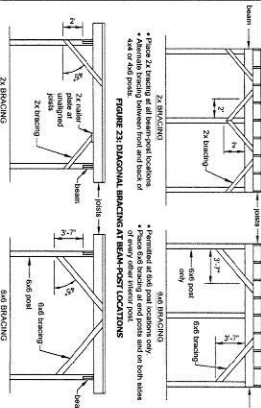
DIAGONAL BRACING AT BEAM-POST LOCATION
